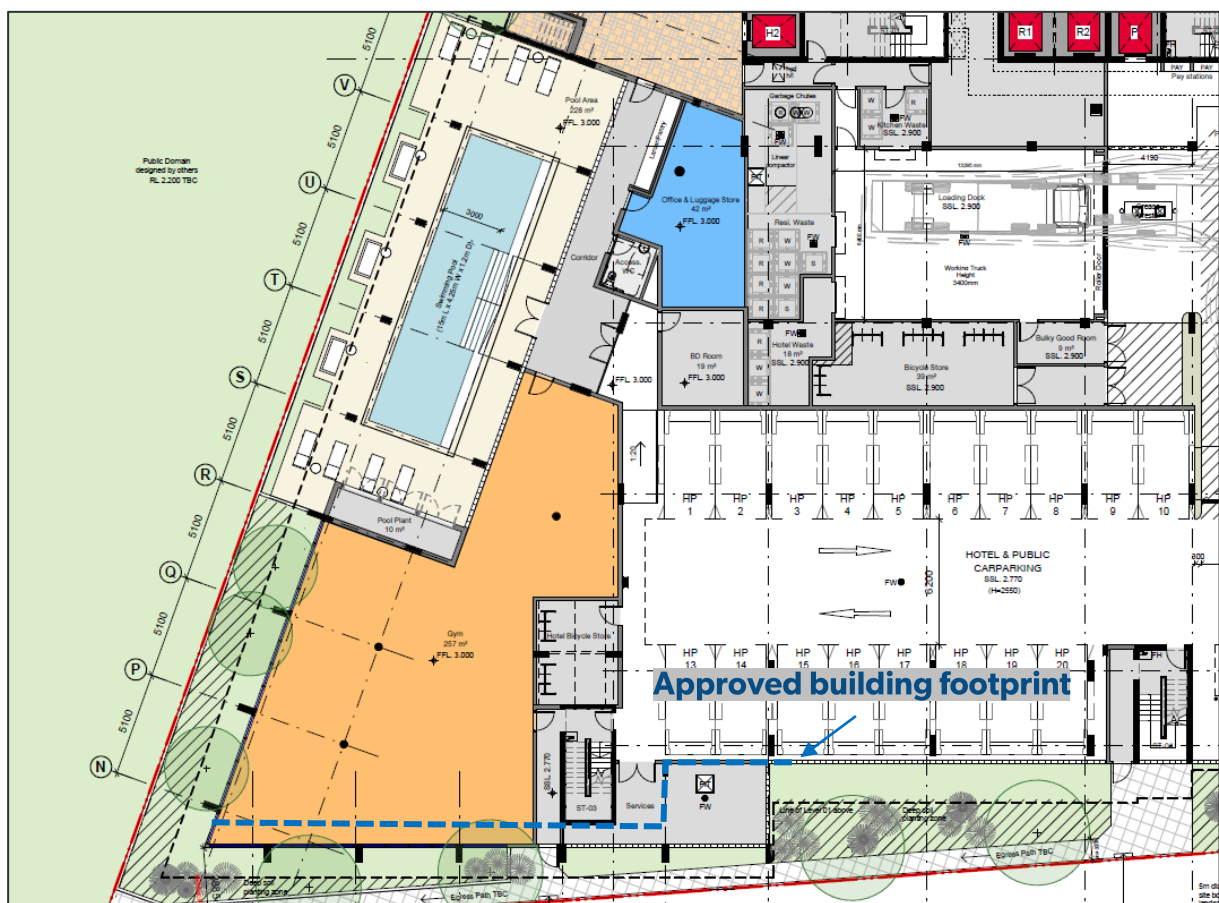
| Ground floor plan (Base source: Applicant's Application)
